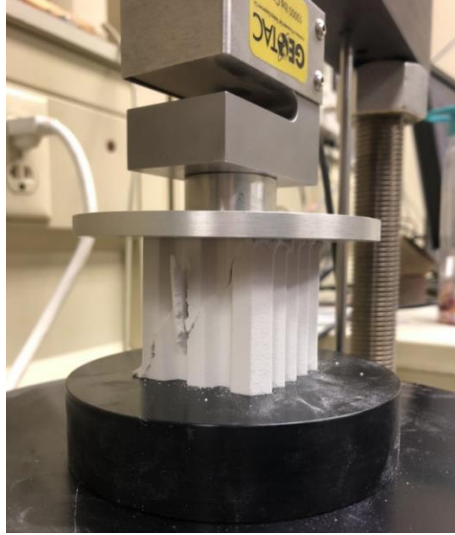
Prototype being tested under uniaxial compression with GEOTAC loading device.
